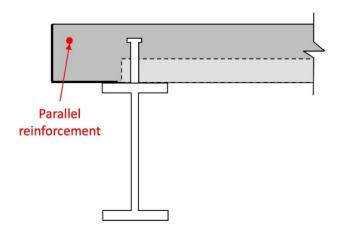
Drawing associated with Question 9 on whether additional slab reinforcement perpendicular to the slab is typically used.
